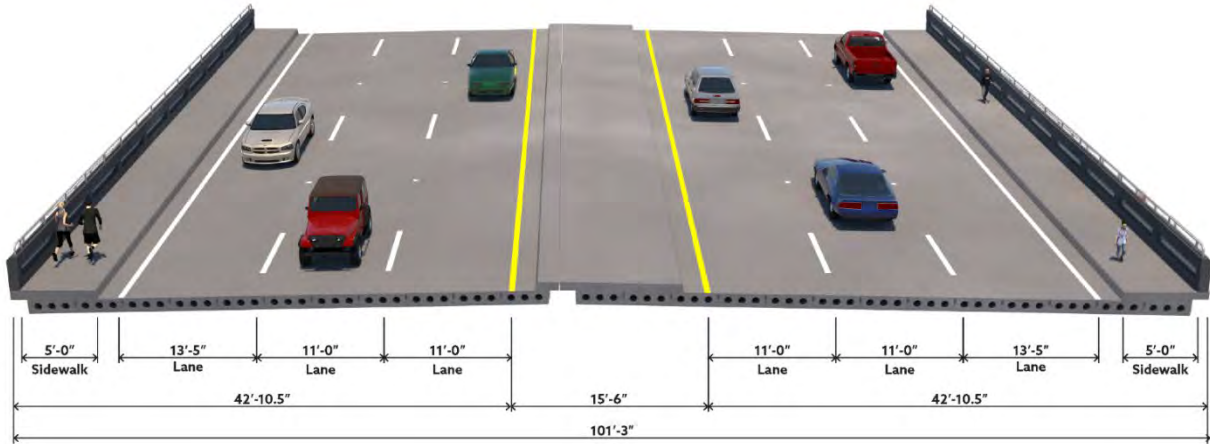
Western Pair Existing Bridge Configuration (Bridge ID Numbers 870083 and 870549)
